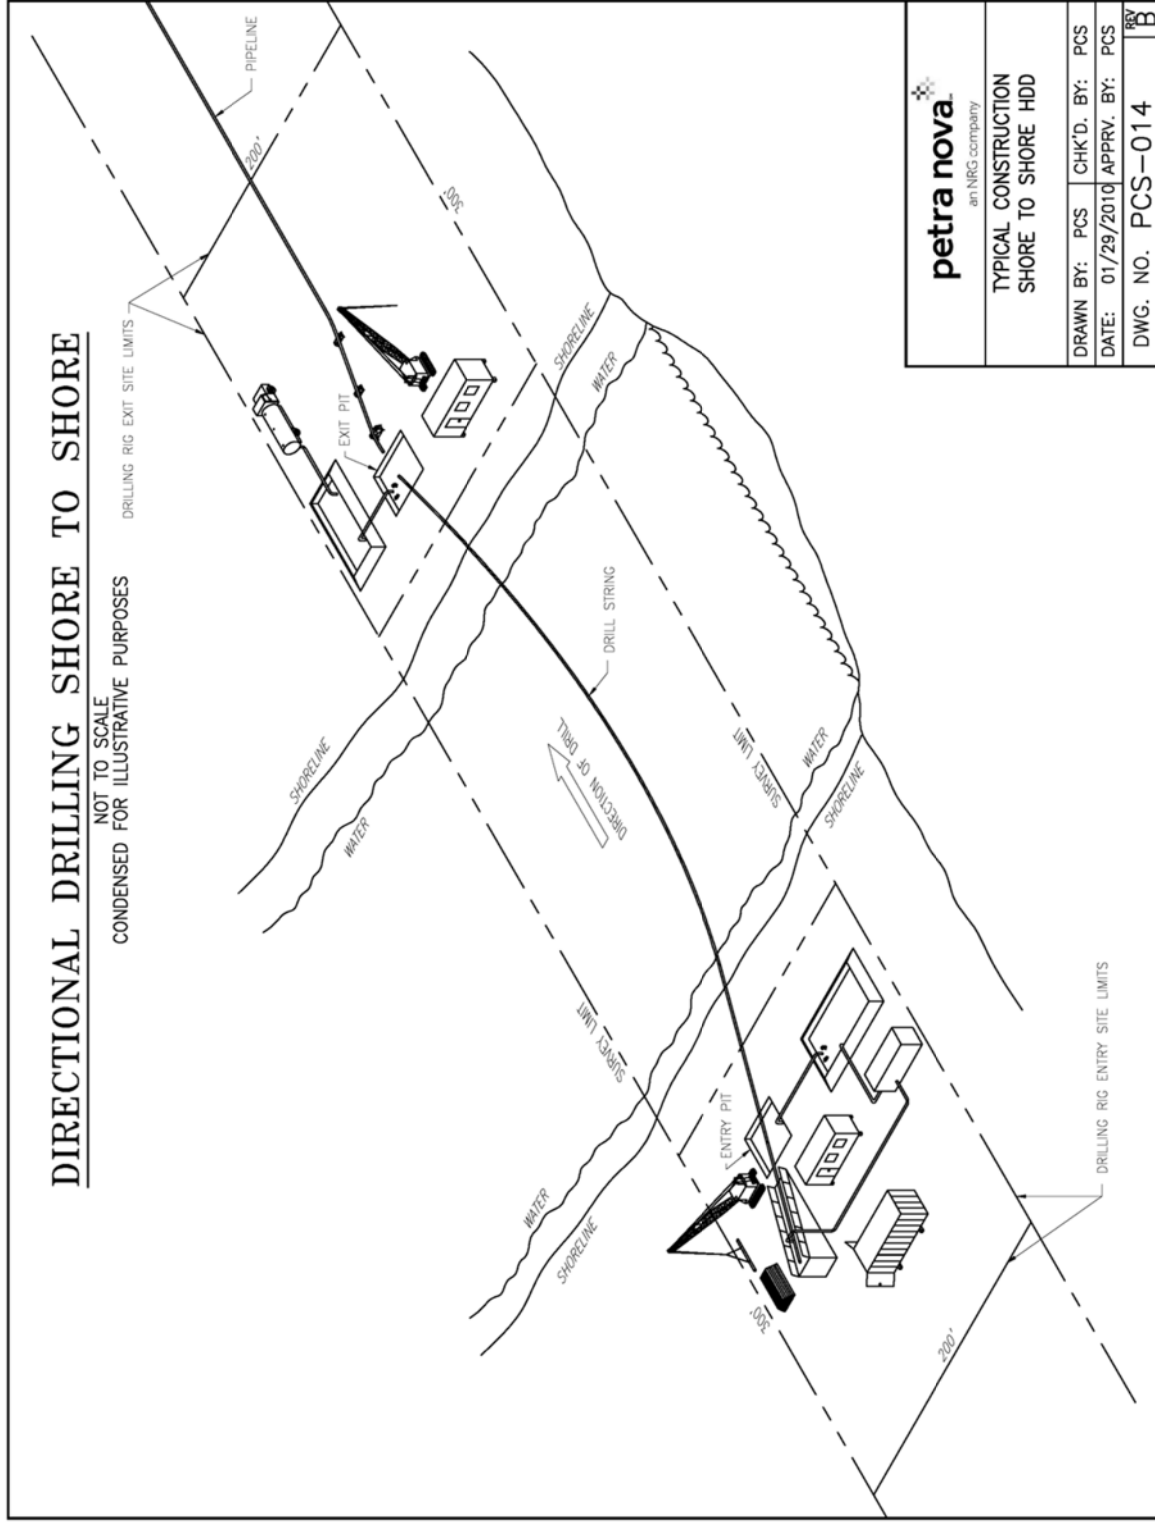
Typical HDD Waterbody Crossing Plot Plan
